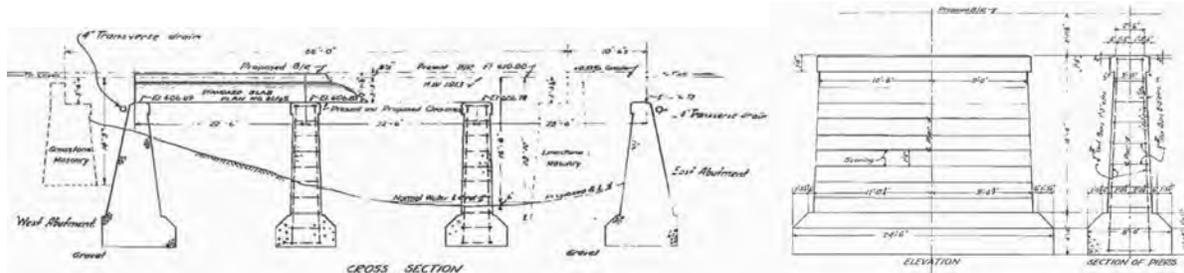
NS CF-35.40 over Cotton Run Existing Cross Section and Bridge Pier Details
